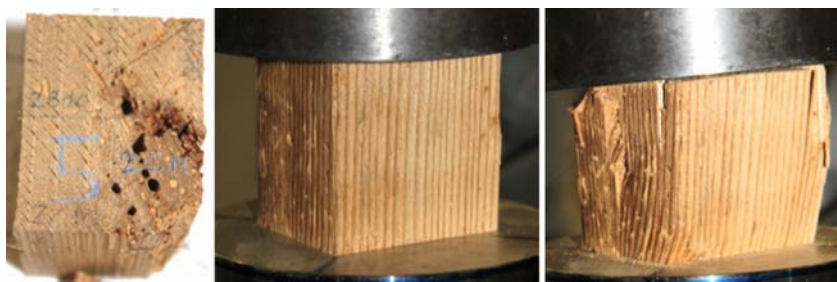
Close-up photo of specimen 5 from top, before testing; behaviour of specimen under load
